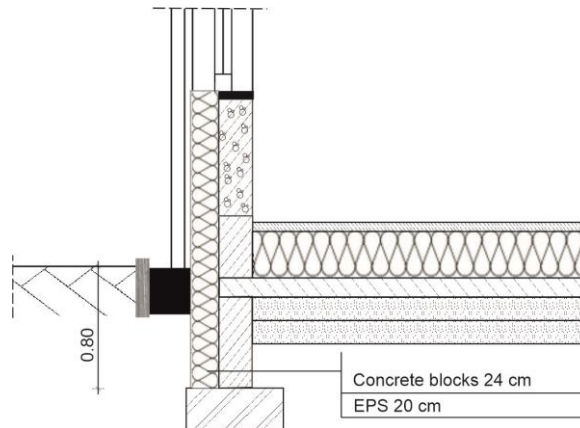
Diagram of vertical polystyrene insulation applied to the foundation walls of buildings B1 and B2
